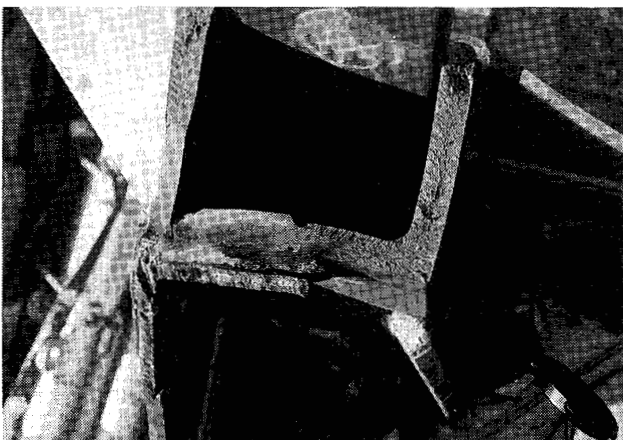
Brittle failure initiated from welds of tower crane.
